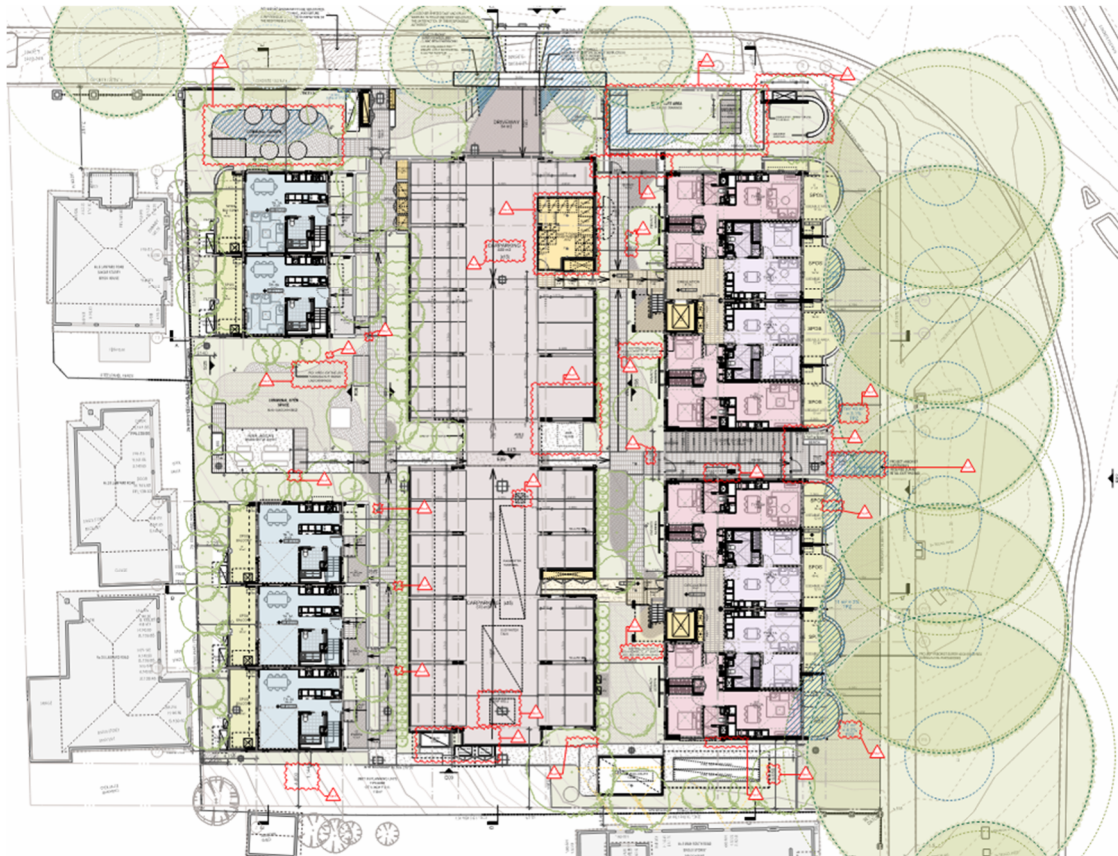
Ground Floor Plan (source: Lian Project No: HC02 dated 03/06/2026)
